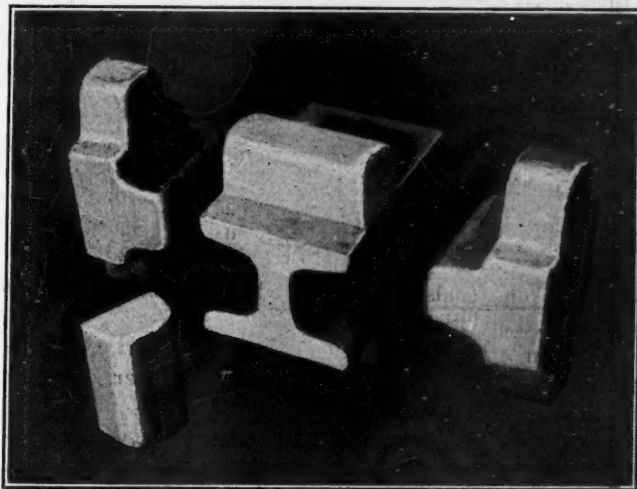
DETAILS OF "PILLOW BLOCKS AND FILLERS" USED IN SECTIONAL CONCRETE RETAINING WALLS
